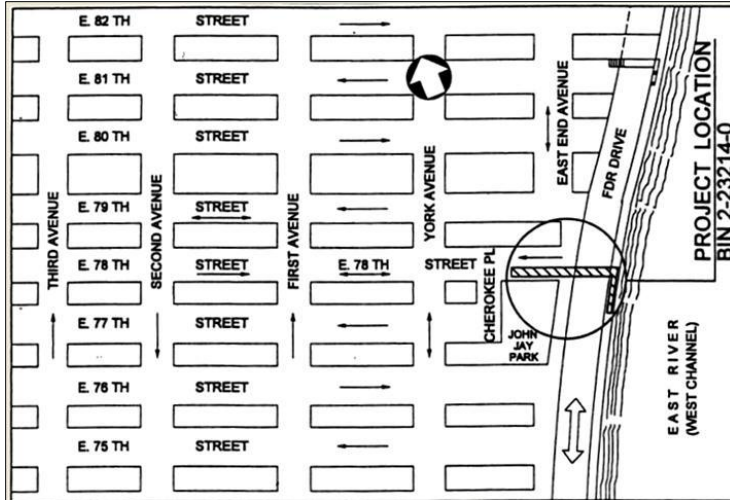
The East 78<sup>th</sup> Street Bridge location plan in Manhattan.
